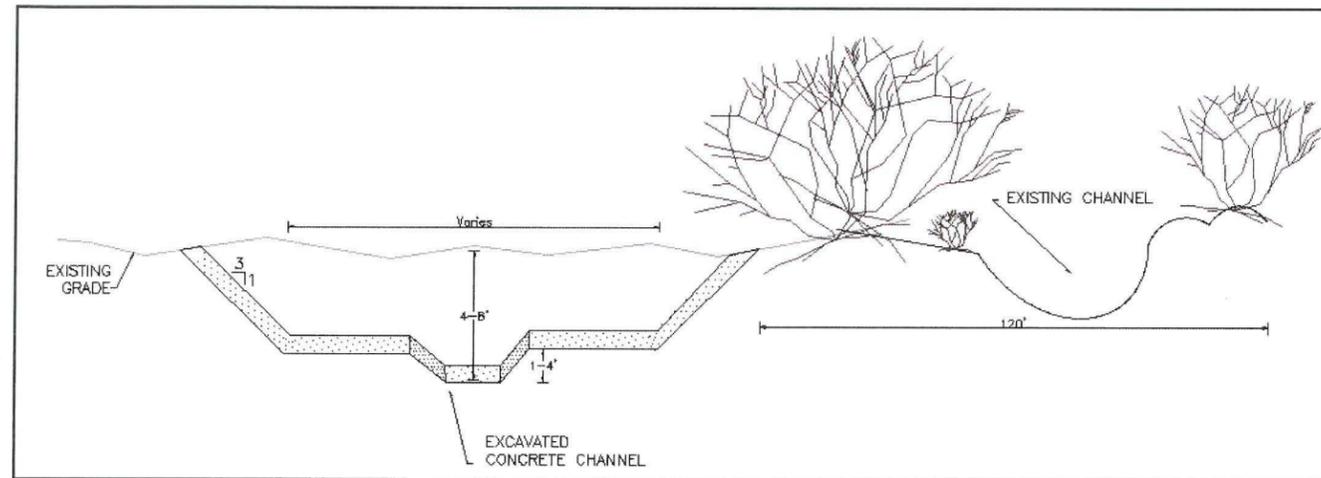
Concept Cross Section for Concrete Companion Channel (Alternative C) (Not to scale)
